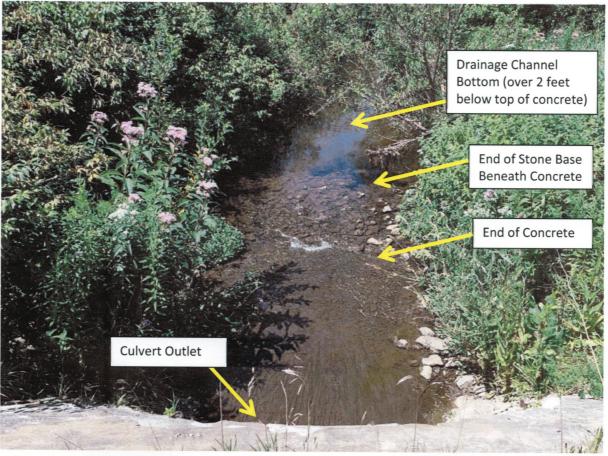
Outlet side (west side) of Sharp Rd culvert showing concrete and stone base placed more than 2 feet above channel bottom.
